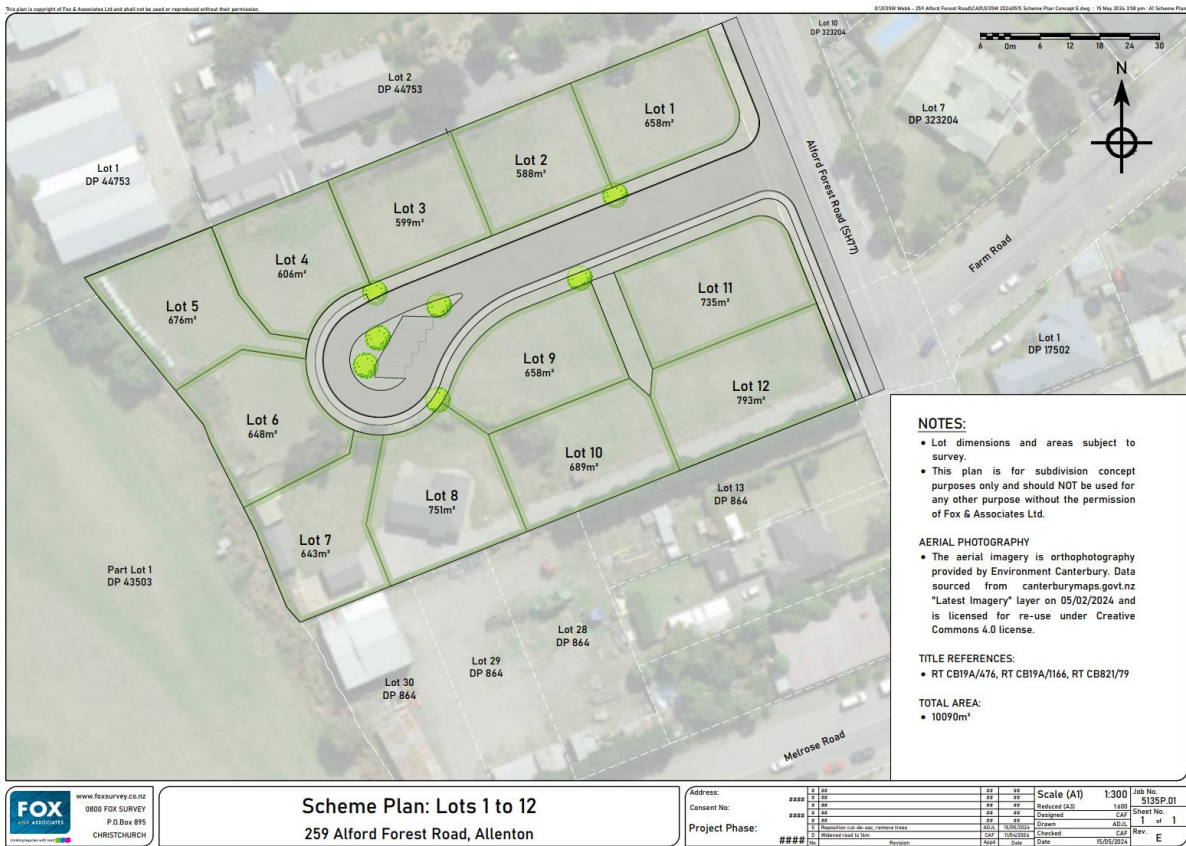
Draft Scheme Plan 259 Alford Forest Road
